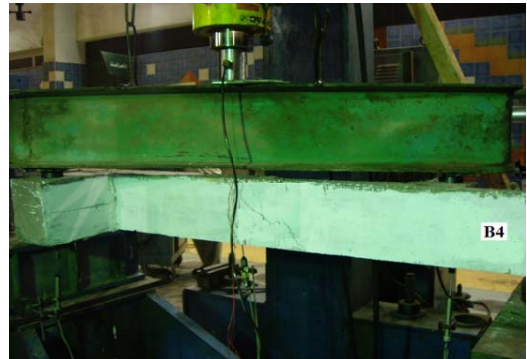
(e) Failure modes and crack patterns of the tested beam B4
